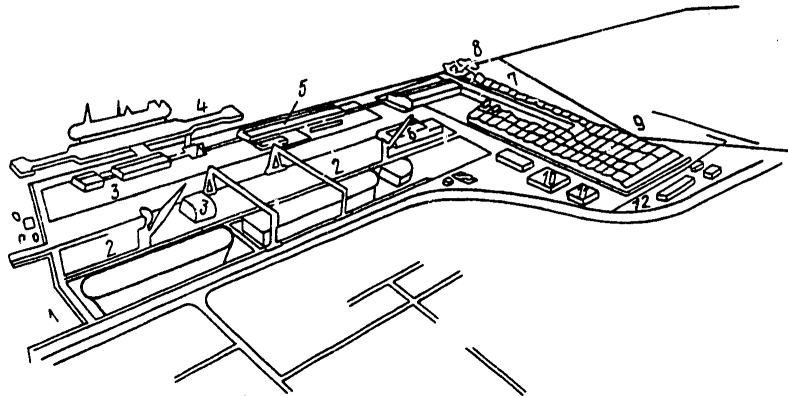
Master plan of shipyard in Tita of the Isikavadzima-Kharima Heavy Industries Company. 1--building docks; 2--module storage area; 3--outfitting and installation shops; 4--outfitting quay; 5--paint shop; 6--assembly-welding shop (assembly of modules); 7--assembly-welding shop (assembly of the mid-section of the hull); 8--steel storage; 9--hull platers shop; 10--pipe fabrication shop; 11--electromechanical shop; 12--main administrative building.
